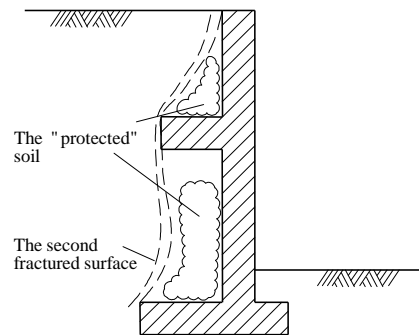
Part of Filling Apart From Fractured Surface in Retaining Wall with Relieving Plate
